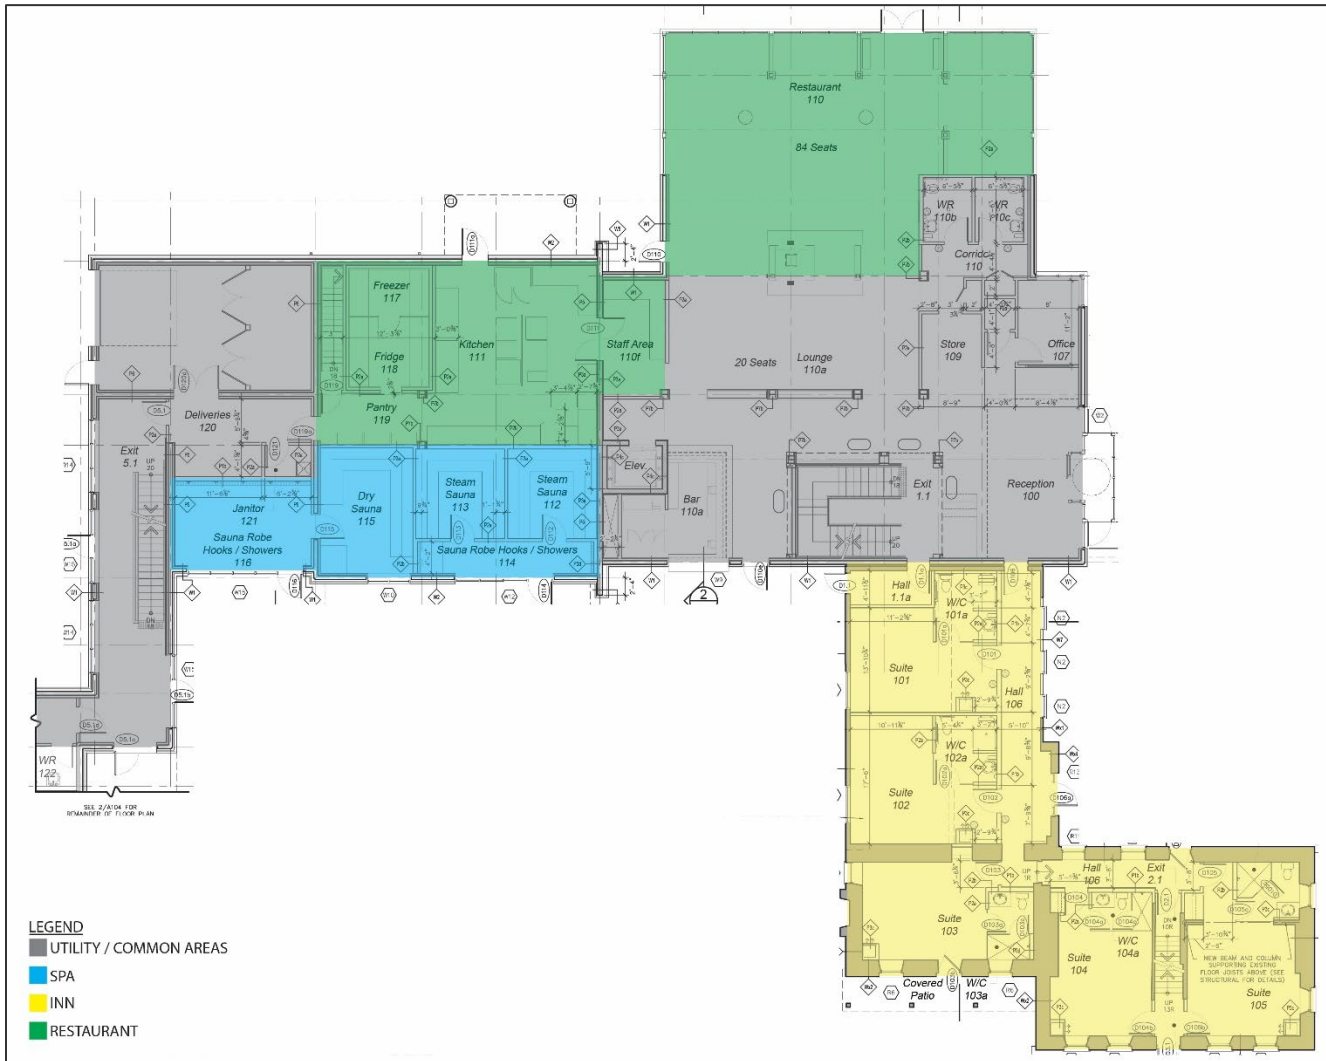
Floor Plans (source: Shoalts and Zaback Architects)
